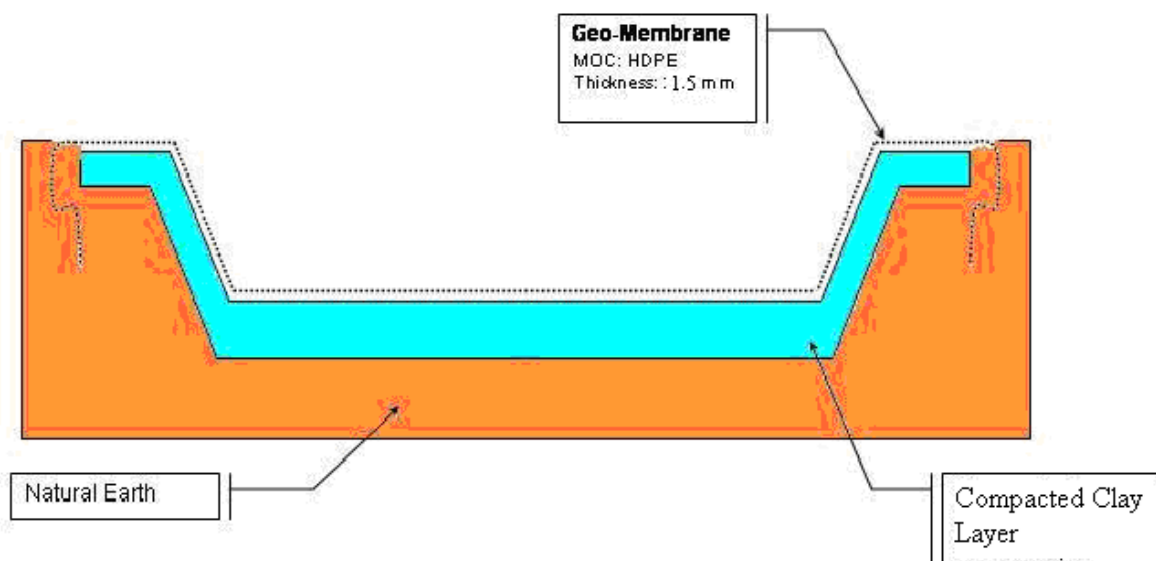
Typical section view of drilling cut and drilling mud collection pit
